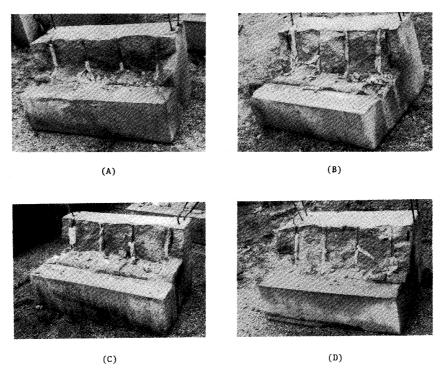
Typical fractured specimens. (A) Inclined Angle $\theta = 90^{\circ}$, Burden W=8 cm, toe hole. (B) $\theta = 75^{\circ}$, W=8 cm, toe hole. (C) O=75°, W=12 cm, toe hole. (D) $\theta = 60^{\circ}$, W=8 cm.
